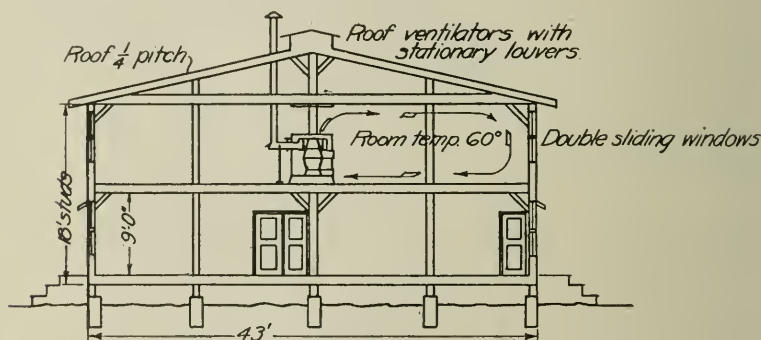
Elevation Section of Company Barrack. Two Room Heater on Each Floor.
